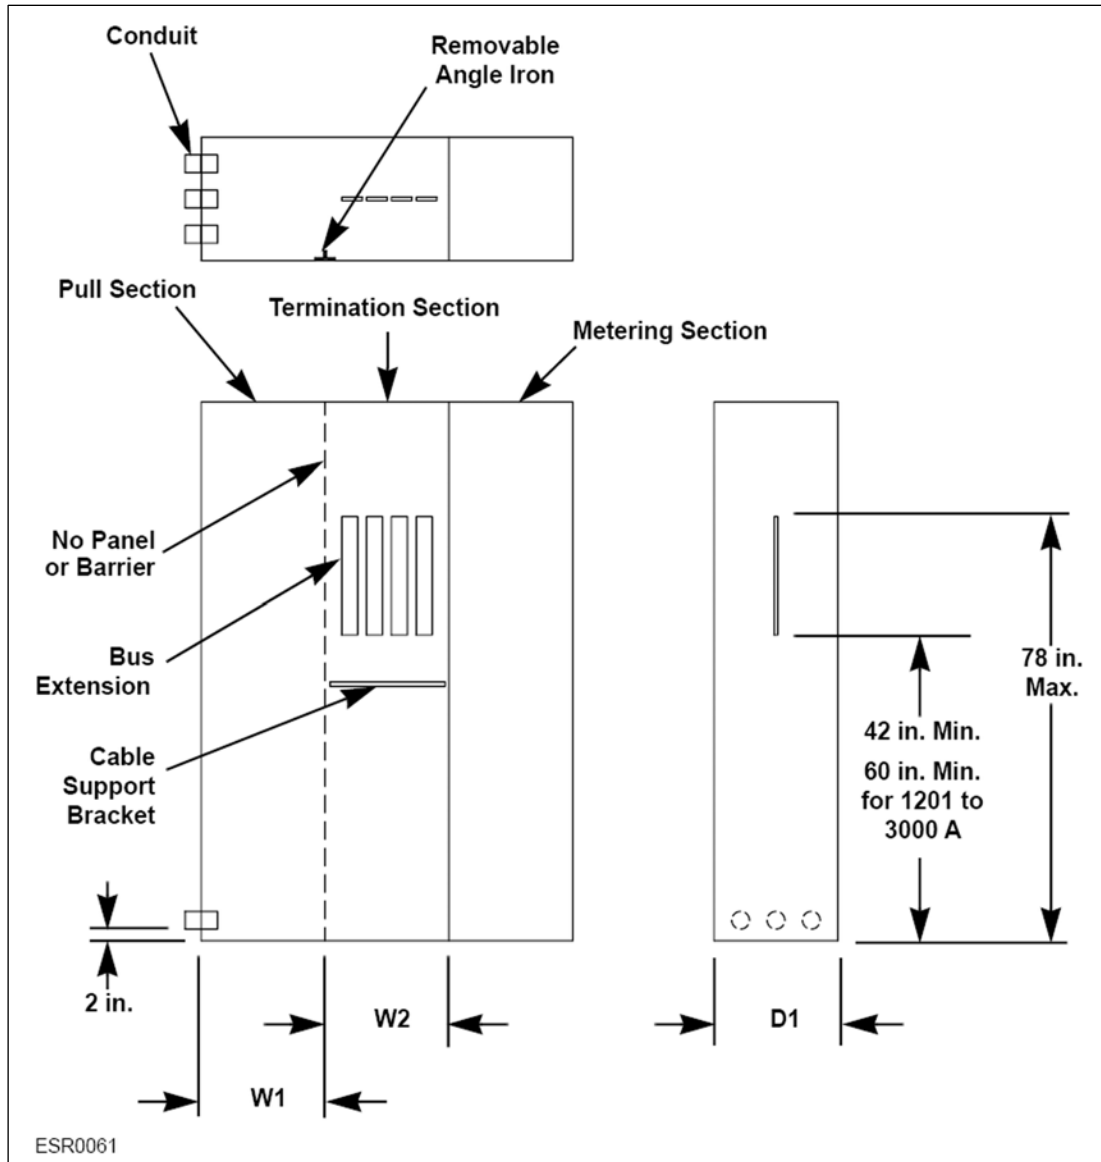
Underground Service Termination in a Pull Section Below Ground Level, Showing Pull Section with Side-Entry Conduits at the Bottom
